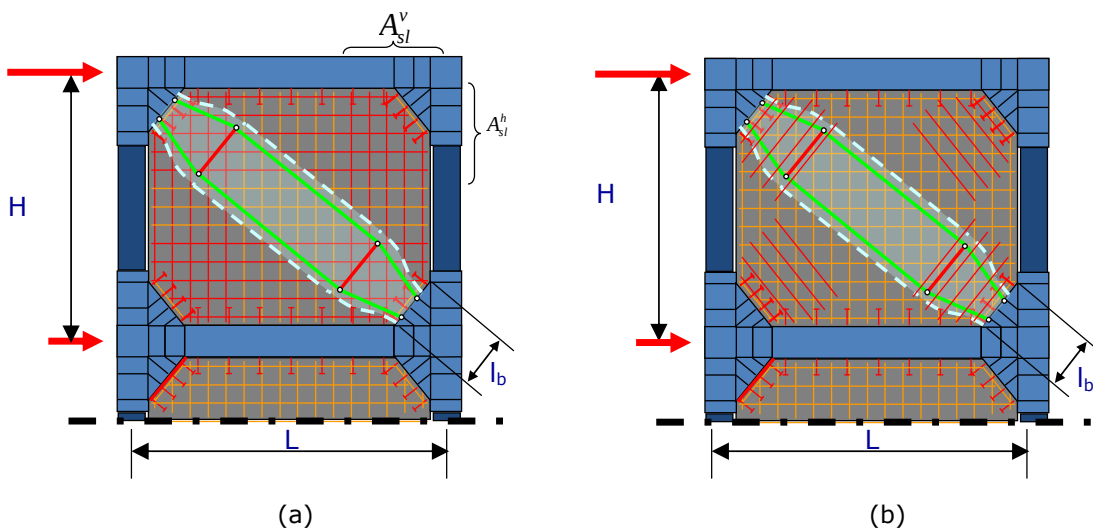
Wall reinforcements: (a) with orthogonal rebar layout; (b) with additional stirrups
